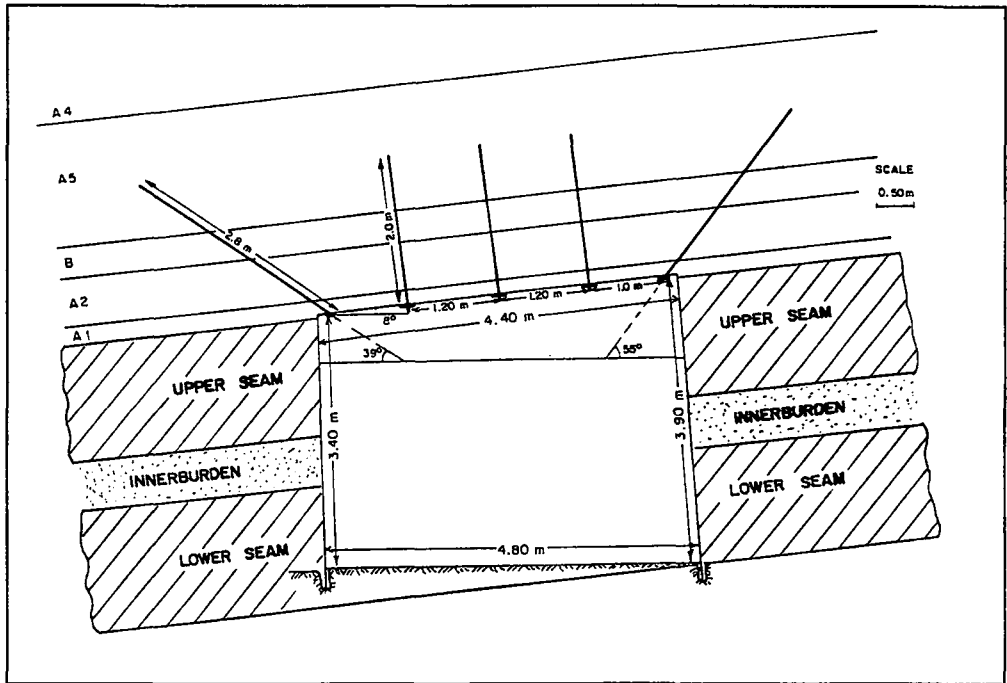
Cross section of bolted gate road with split-set at Çayırhan Lignite Mine
